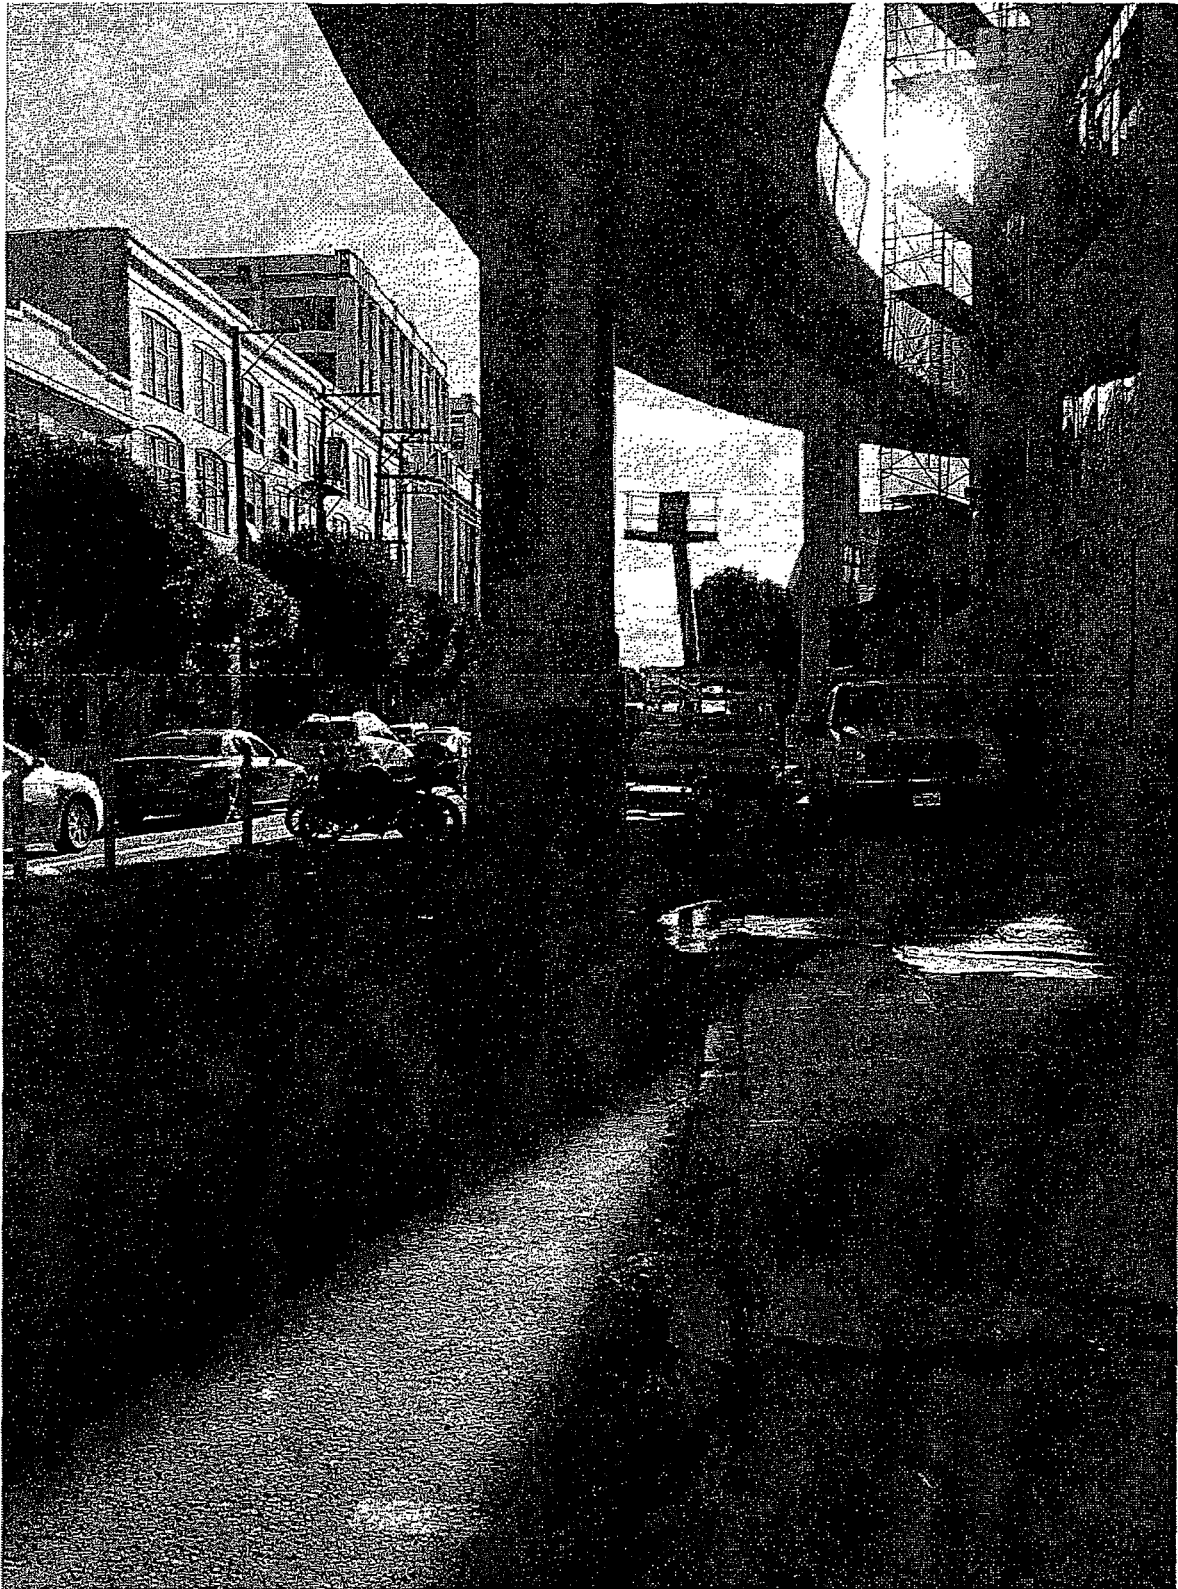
View west along Bryant Street from Rincon Street. Project site and fronting sidewalk are on the right, and the westbound I-80 Harrison Street off-ramp viaduct is overhead. — February 13, 2015
